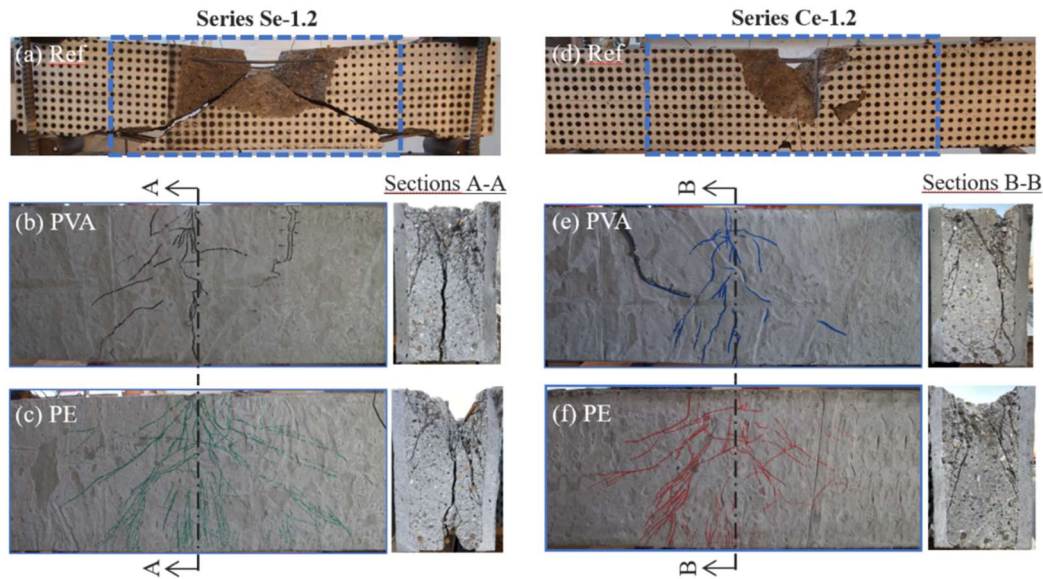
Comparative damage assessment of the specimens tested under 29.9 m/s: influence of the stirrups and the SHCC reinforcement: (a) Cracking pattern of the reference specimen without stirrups; (b) Highlighted cracking pattern and middle cross-section of the specimen without stirrups and strengthened with PVA-SHCC; (c) Highlighted cracking pattern and middle cross-section of the specimen without stirrups and reinforced with PE-SHCC; (d) Cracking pattern of the reference specimen with stirrups; (e) Highlighted cracking pattern and middle cross-section of the specimen with stirrups and reinforced with PVA-SHCC; (f) Highlighted cracking pattern and middle cross-section of the specimen with stirrups and strengthened with PE-SHCC.
